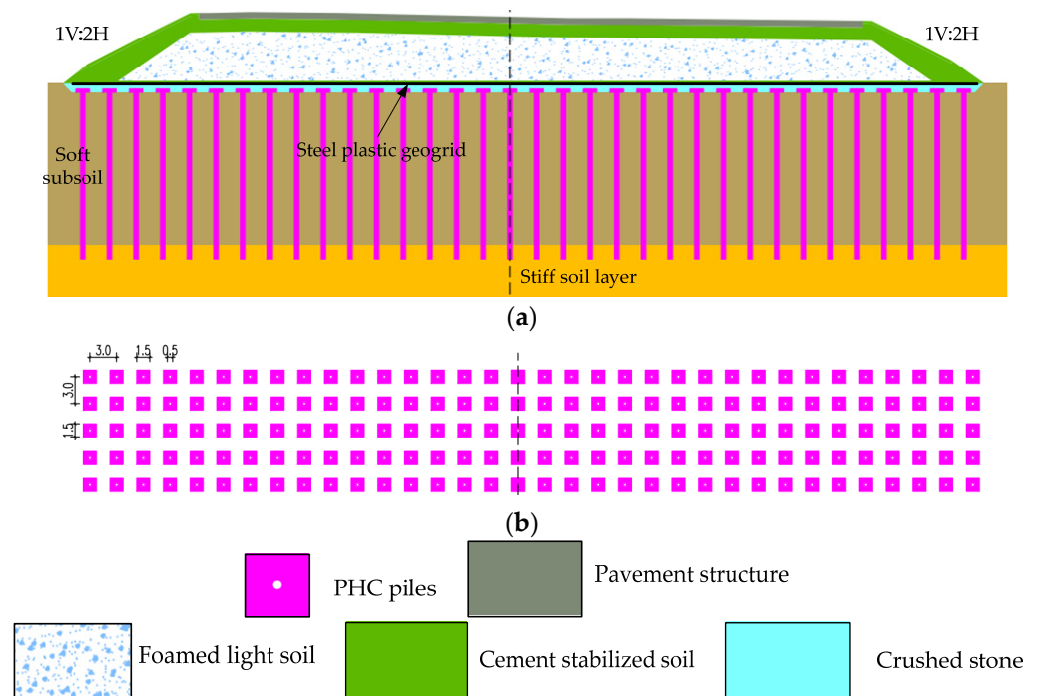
Treatment diagram of PHC pile-net composite foundation: (a) Cross section. (b) Pile location layout.
